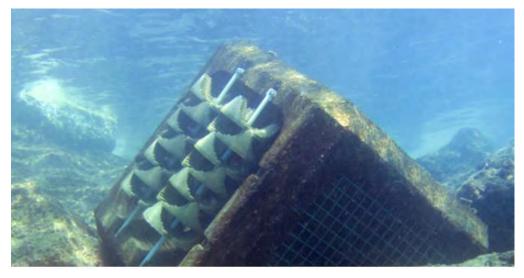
Insitu ECOncrete ECO Armour Block with add-on elements attached to the block faces
